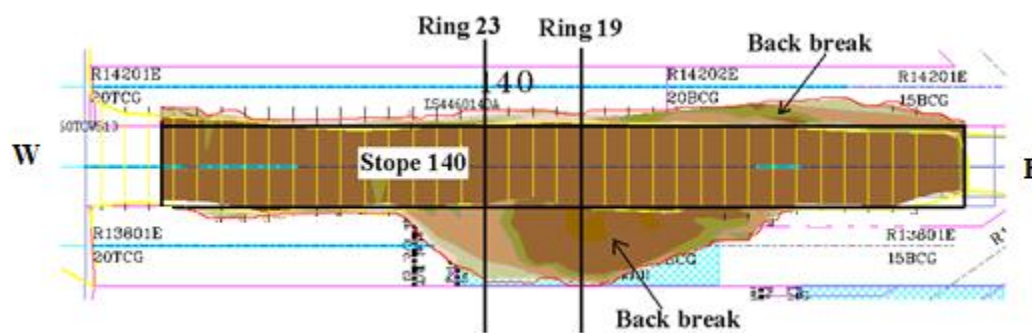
Overbreak and rib failure in stope 140 (plan view)
